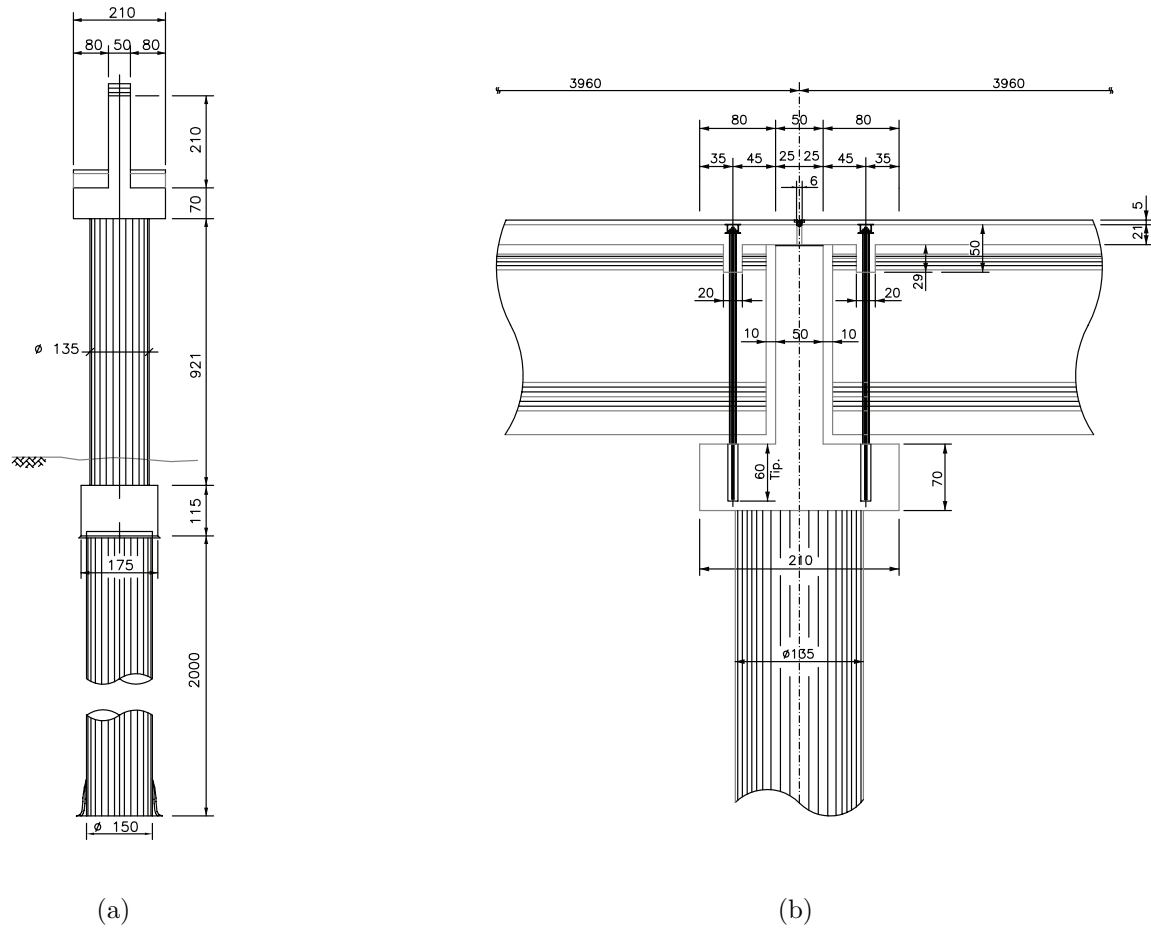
Schematic of (a) bridge approach pier, (b) deck to pier connection. (courtesy Ministerio de Obras Públicas, Chile)
